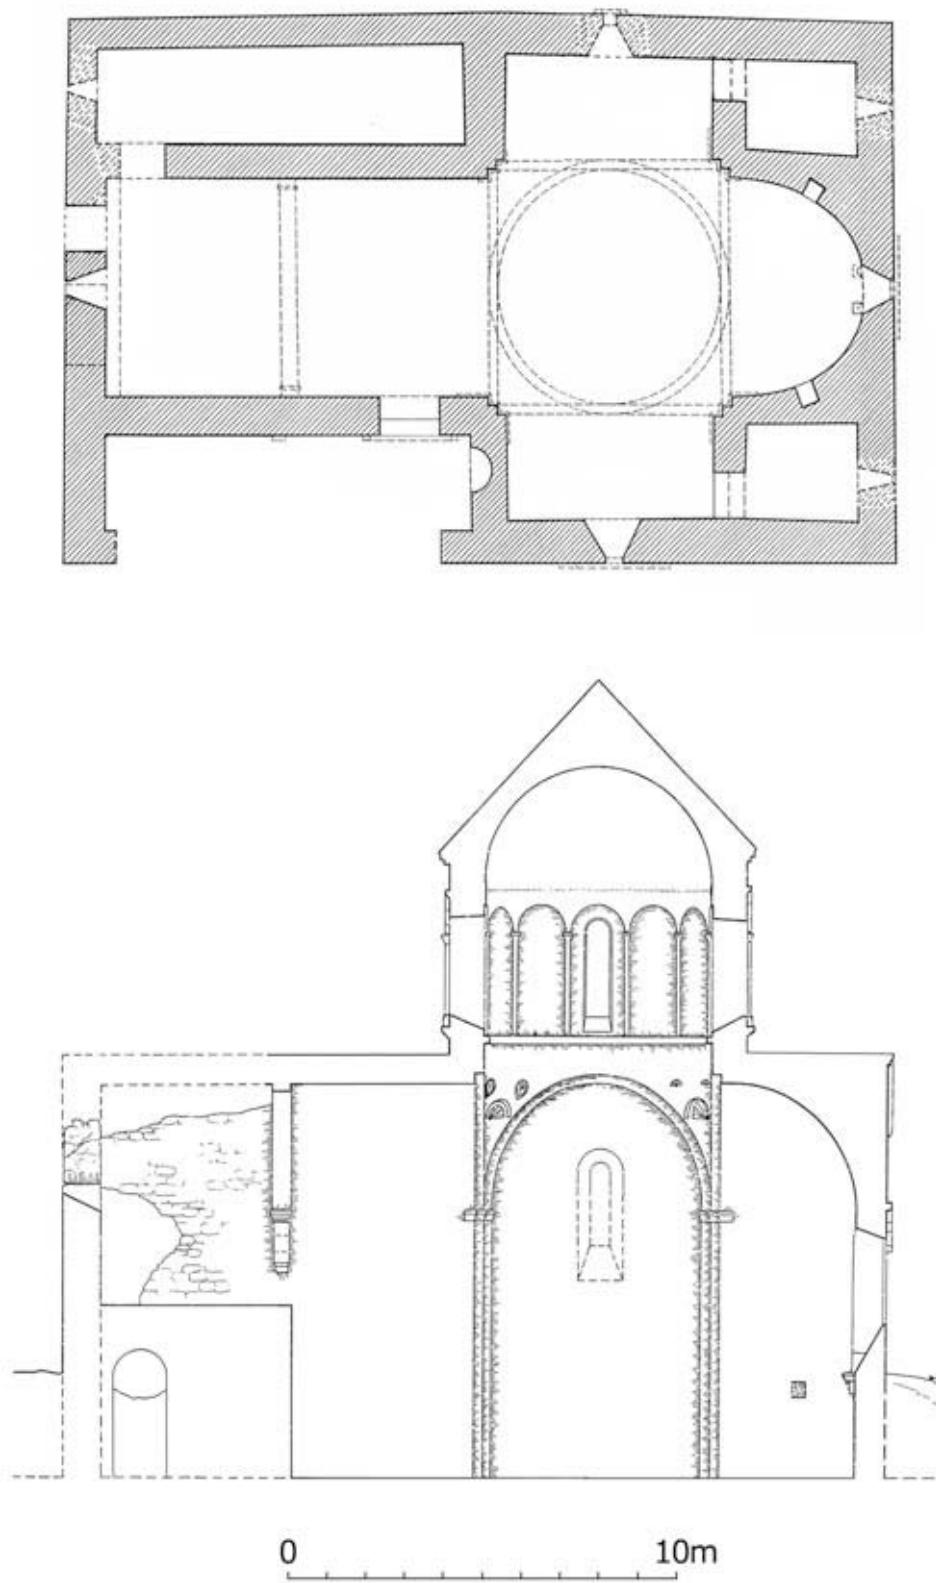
Dolisqana. Church. Plan and longitudinal section looking north
